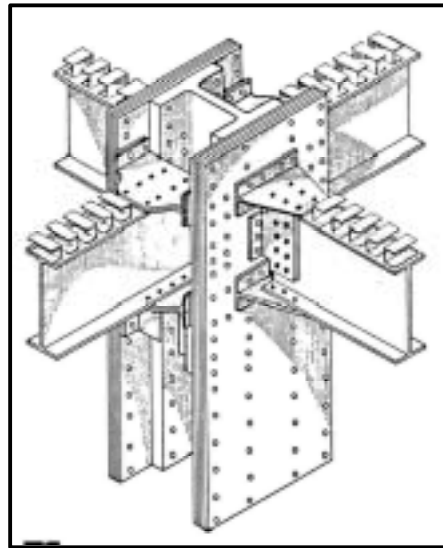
Typical Undamaged Joint in Torre Latino Americana, Mexico City Earthquake, 1985
